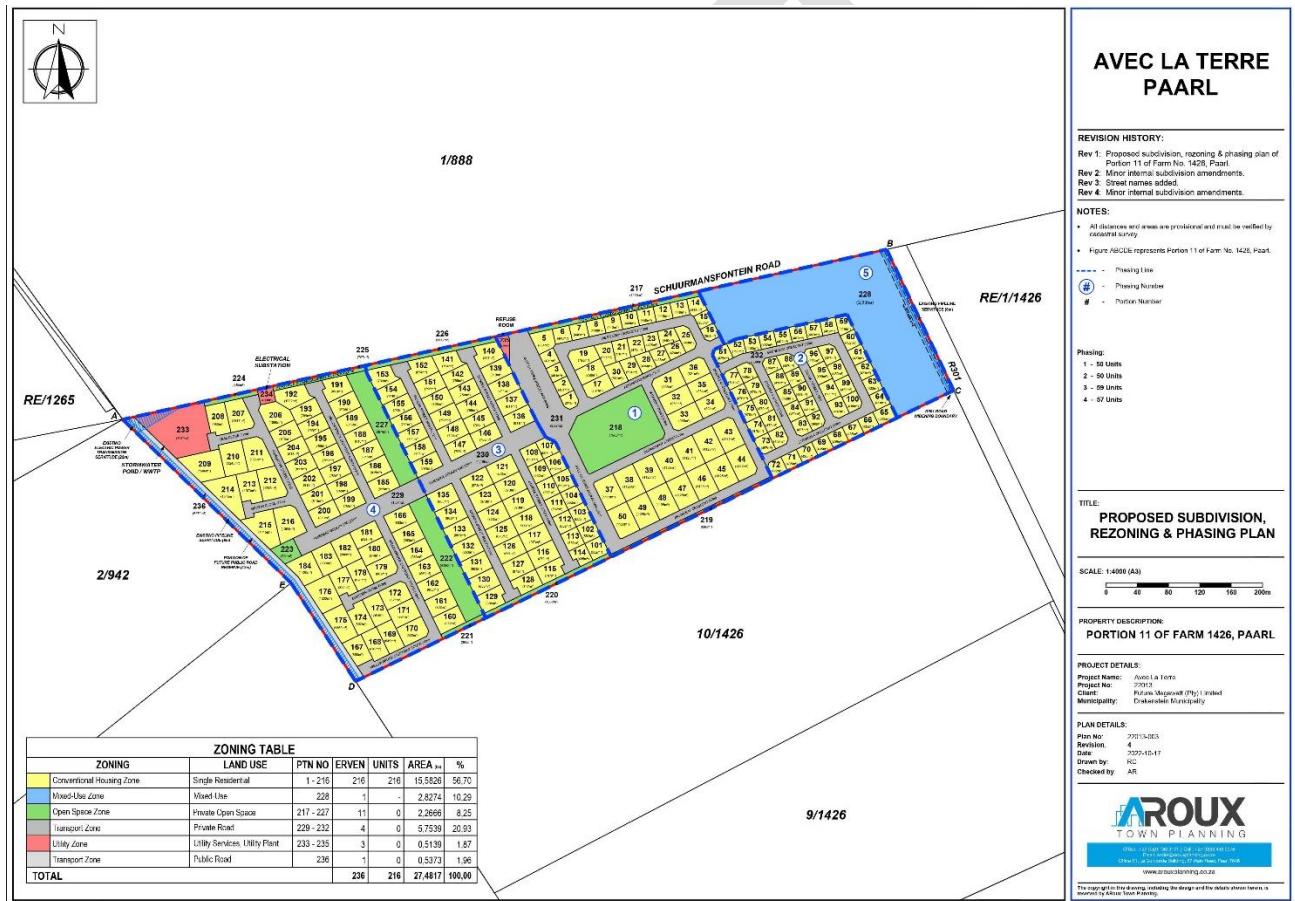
Proposed Subdivision Plan (ARoux Town Planning, 2022)
